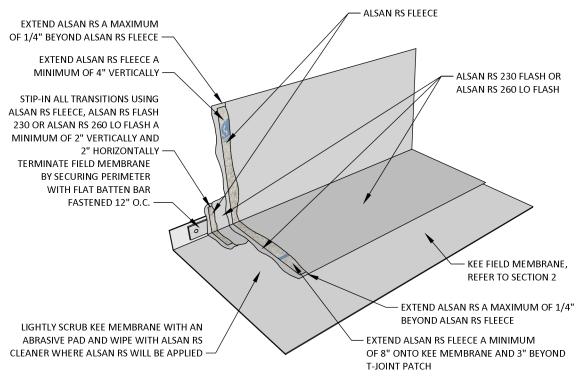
ALSAN® RS Flashing at Wall/Curb with Vertical Perimeter Fastening
